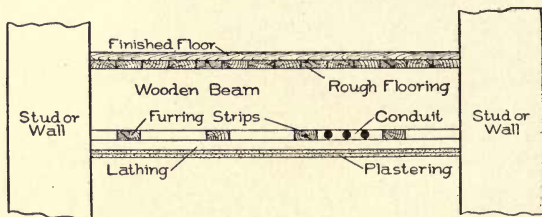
Running Conductors Concealed Under Floor in Wooden Frame Building
